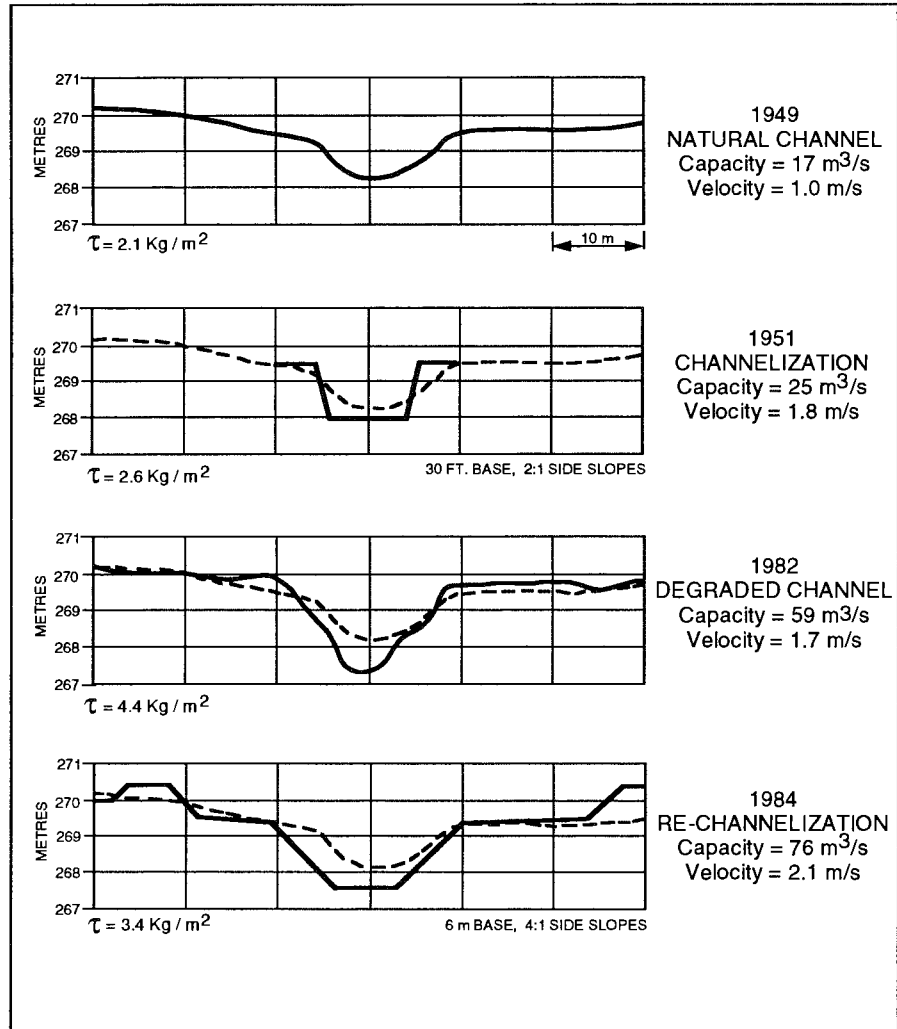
Downcutting and widening in a typical cross-section of Mink Creek following channelization and re-excavation for channel maintenance.
